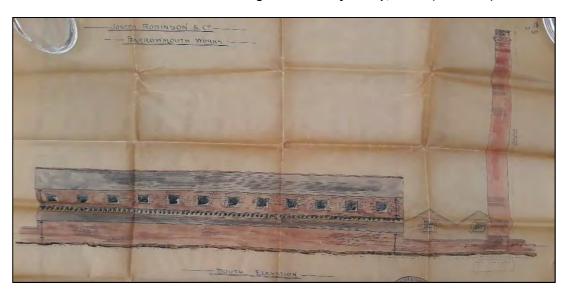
South elevation of alabaster factory, 1888 (Asset 36)
